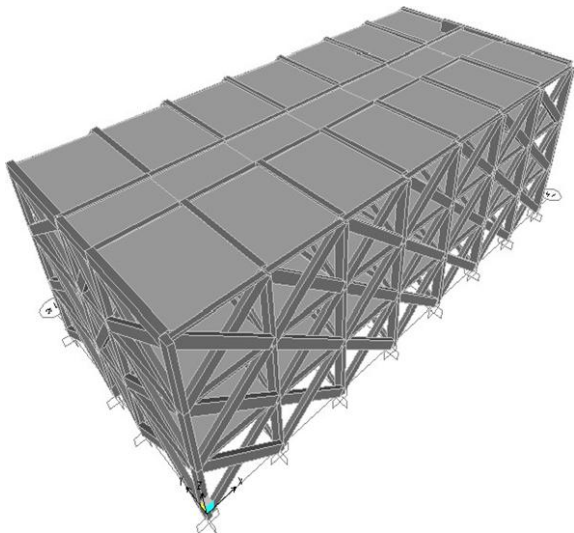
Three Dimensional view of the representing Infills Frame with Braces
